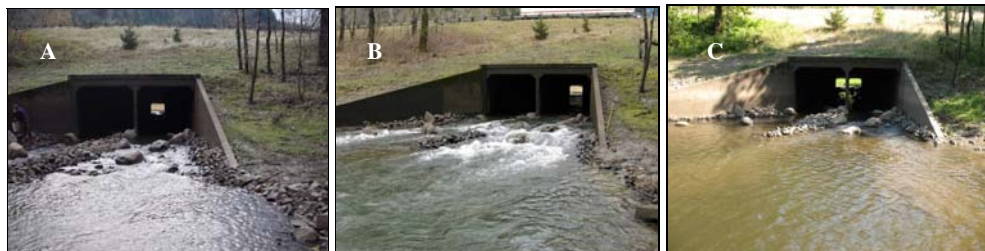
Photos of culvert outlet monitoring locations at the west culvert, Mirror Lake. A) Culvert outlet November 2008; B) Culvert outlet, March 2009; and C) Culvert outlet, July 2009.
